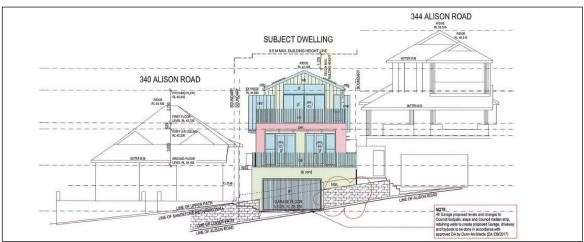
Proposed South (Front) Elevation (Urban Moose)
